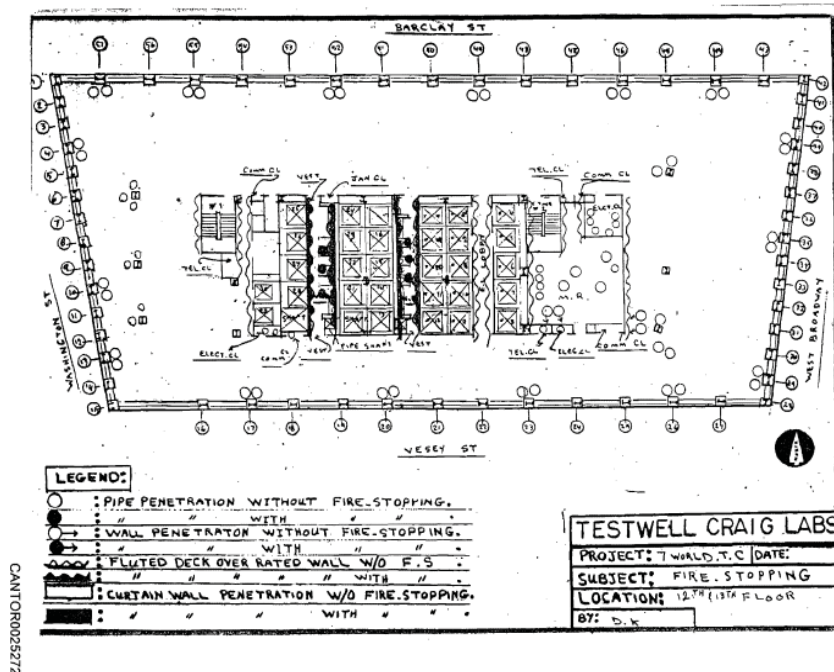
Sketch showing unfilled flutes above fire walls which had firestopping missing (12th and 13th floors).
